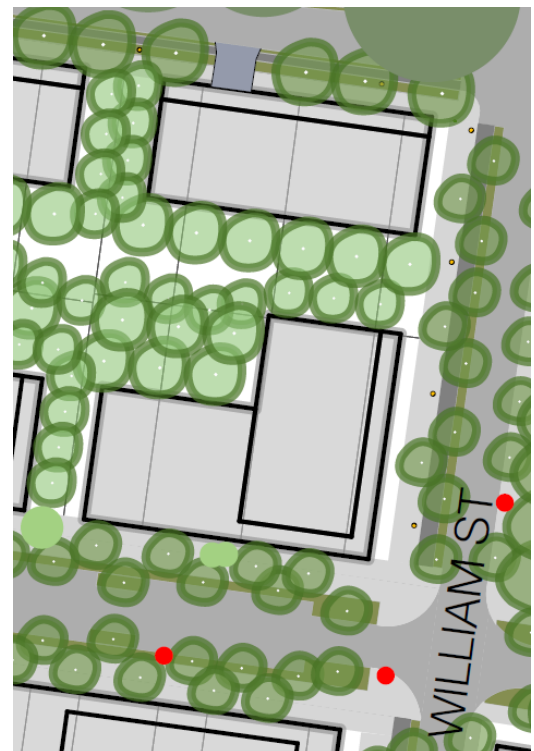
Ground floor open space and tree canopy (PRCUTS Tree Canopy Assessment)
